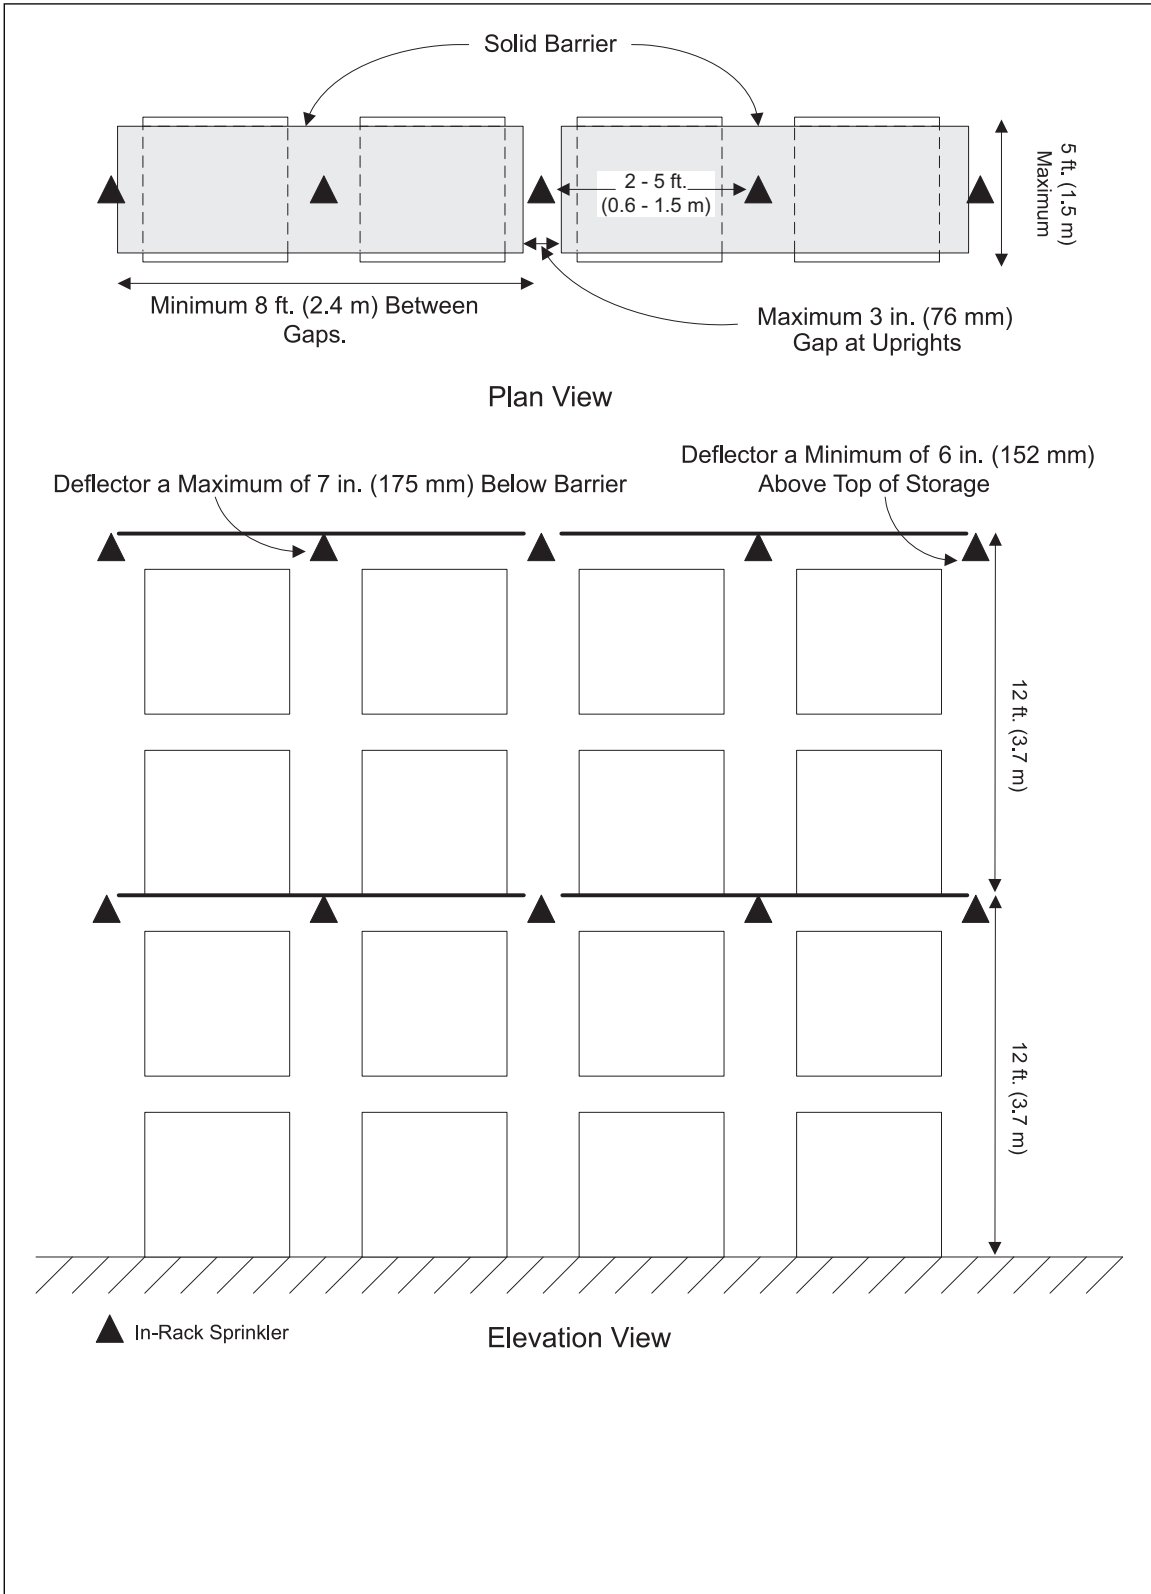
Single-row rack sprinkler layout for li-ion cells or modules.
